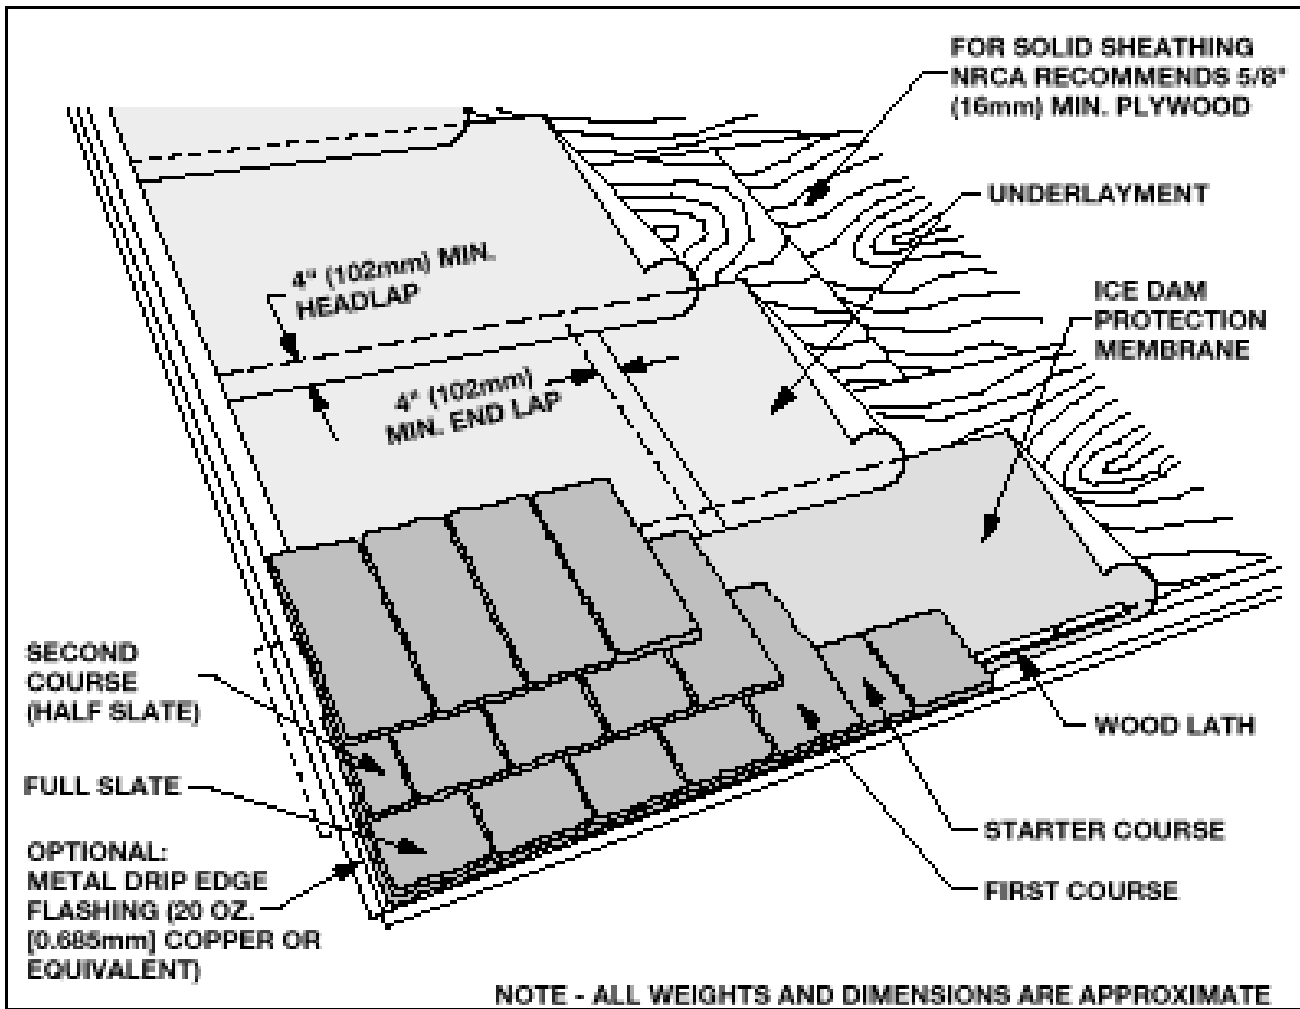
Example showing layout of ice dam protection membrane, 1 ply underlayment, and slate.
